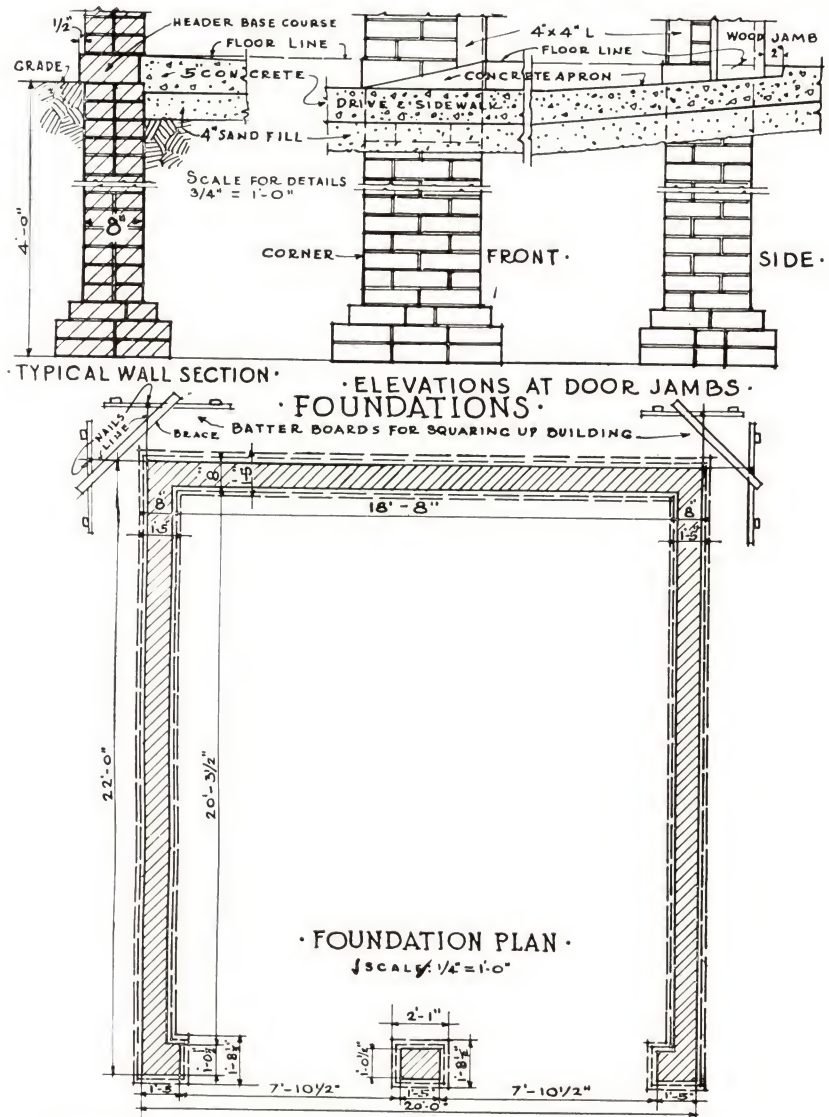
Foundation plan and section of wall and piers constructed of brick.
